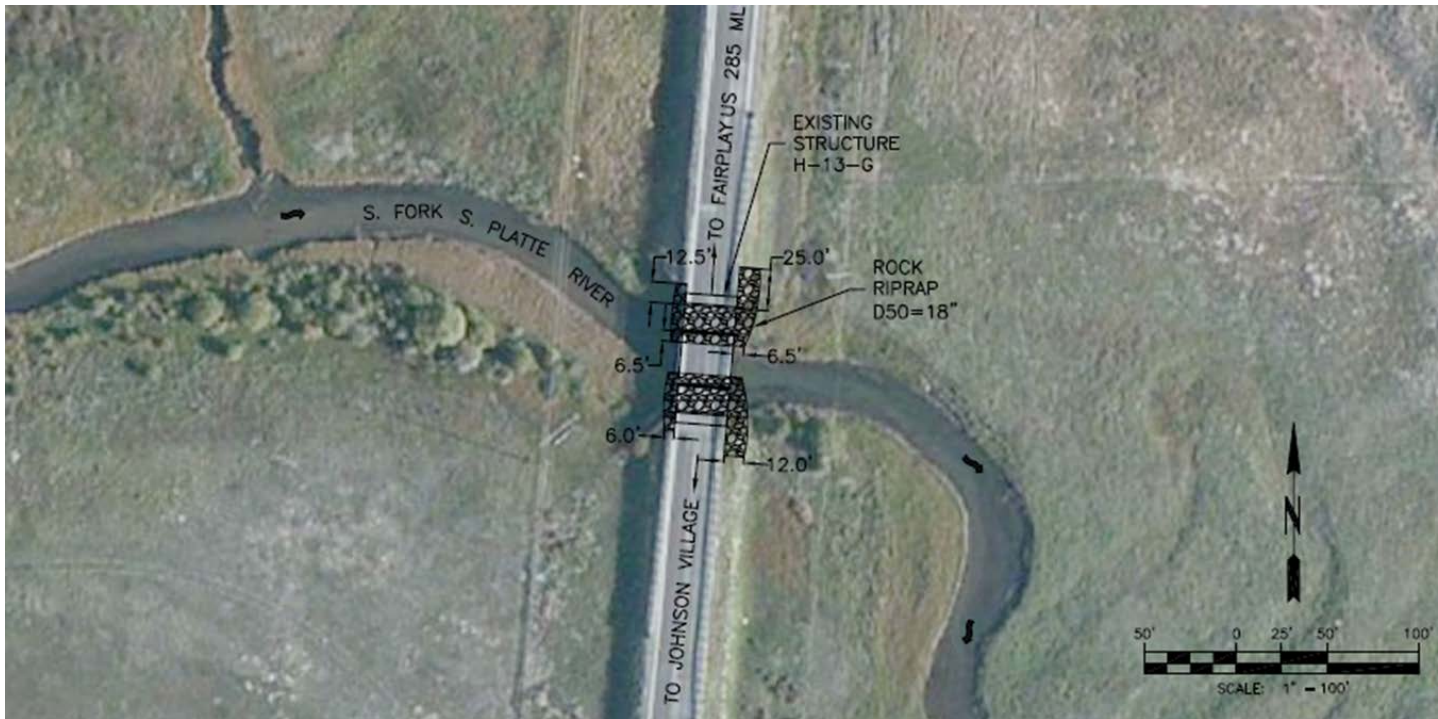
Plan view of Bridge H-13-G with recommended hydraulic scour countermeasure locations
